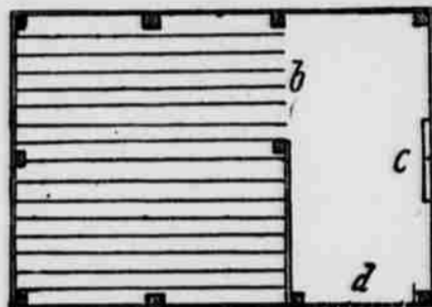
FLOOR PLAN OF CORN HOUSE.
